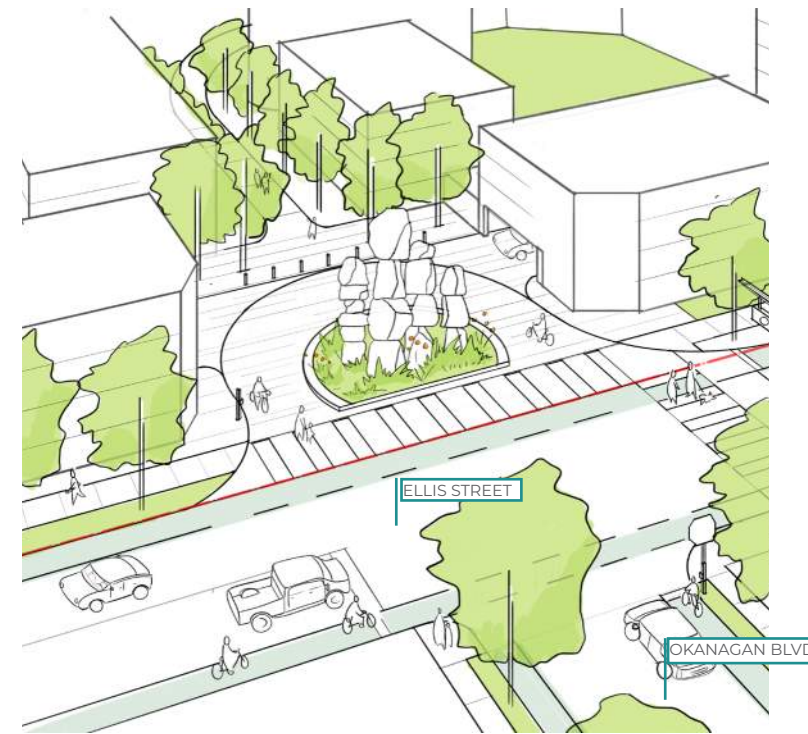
Transportation Vignette - Ellis Street Driveway at Okanagan Boulevard
